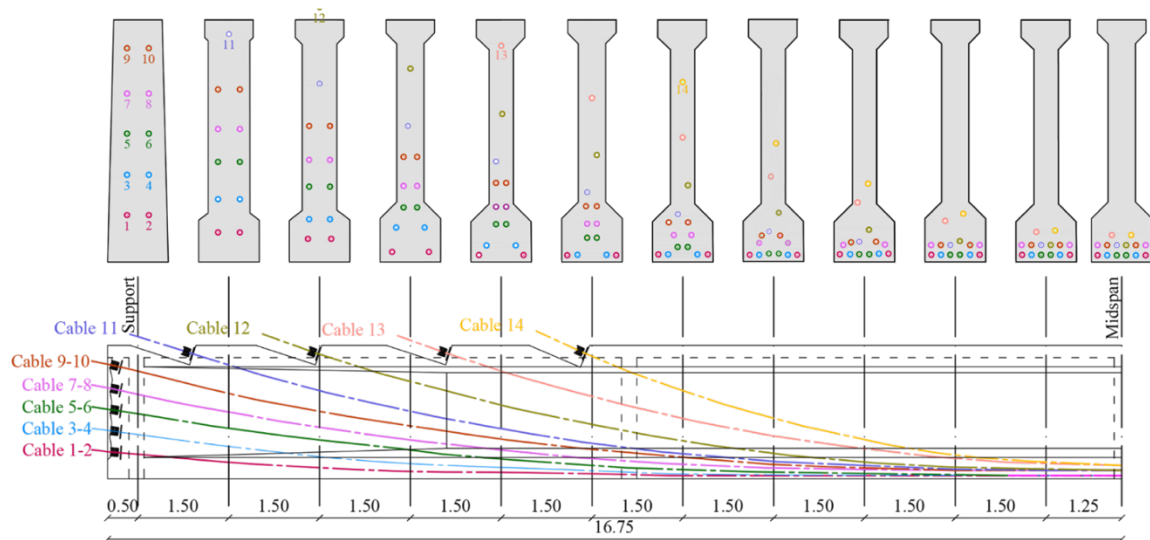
Longitudinal and transversal section of girders with post-tensioned cables
